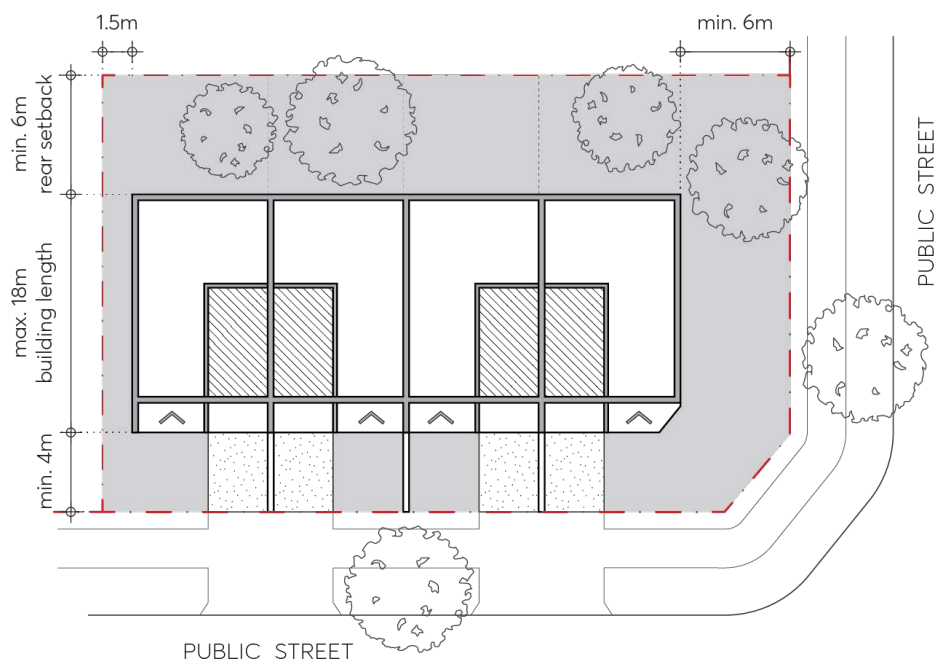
Terrace Housing Corner Site Setbacks
